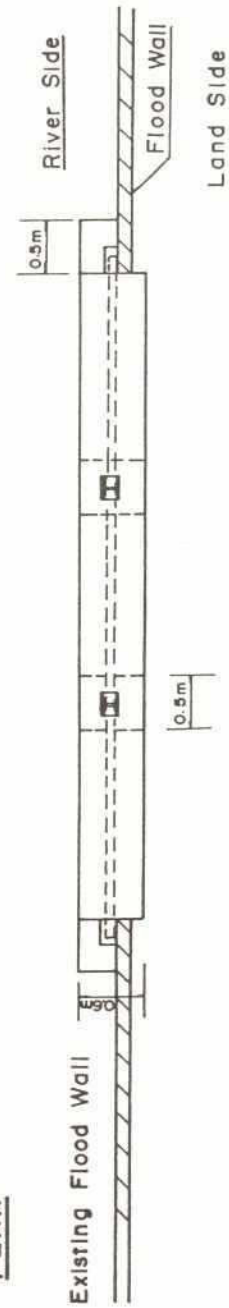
TYPICAL SECTION OF STOP LOG STRUCTURE
